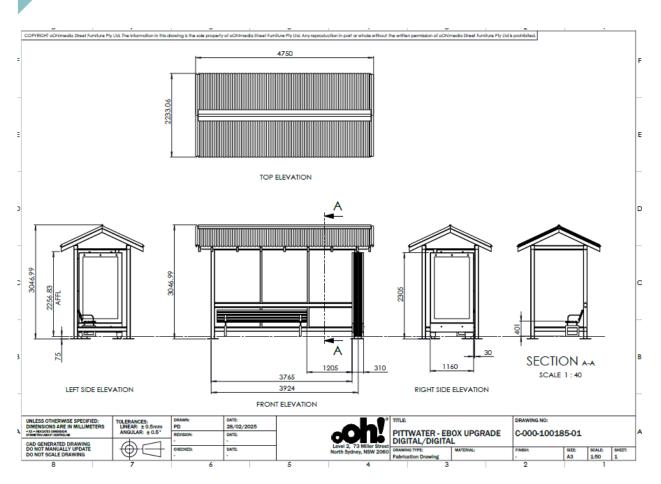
Proposed Digital/Digital Signage Elevation – Pittwater
